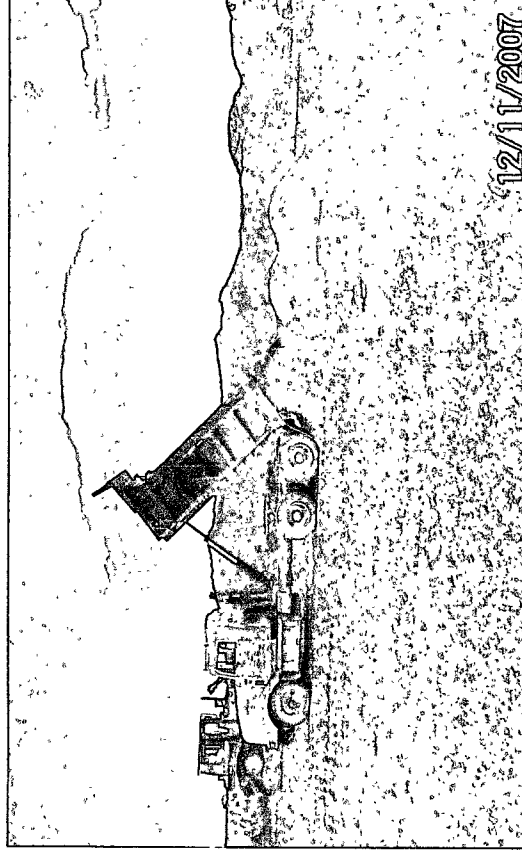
Unloading Caliche into Barrow Pit for Backfilling
